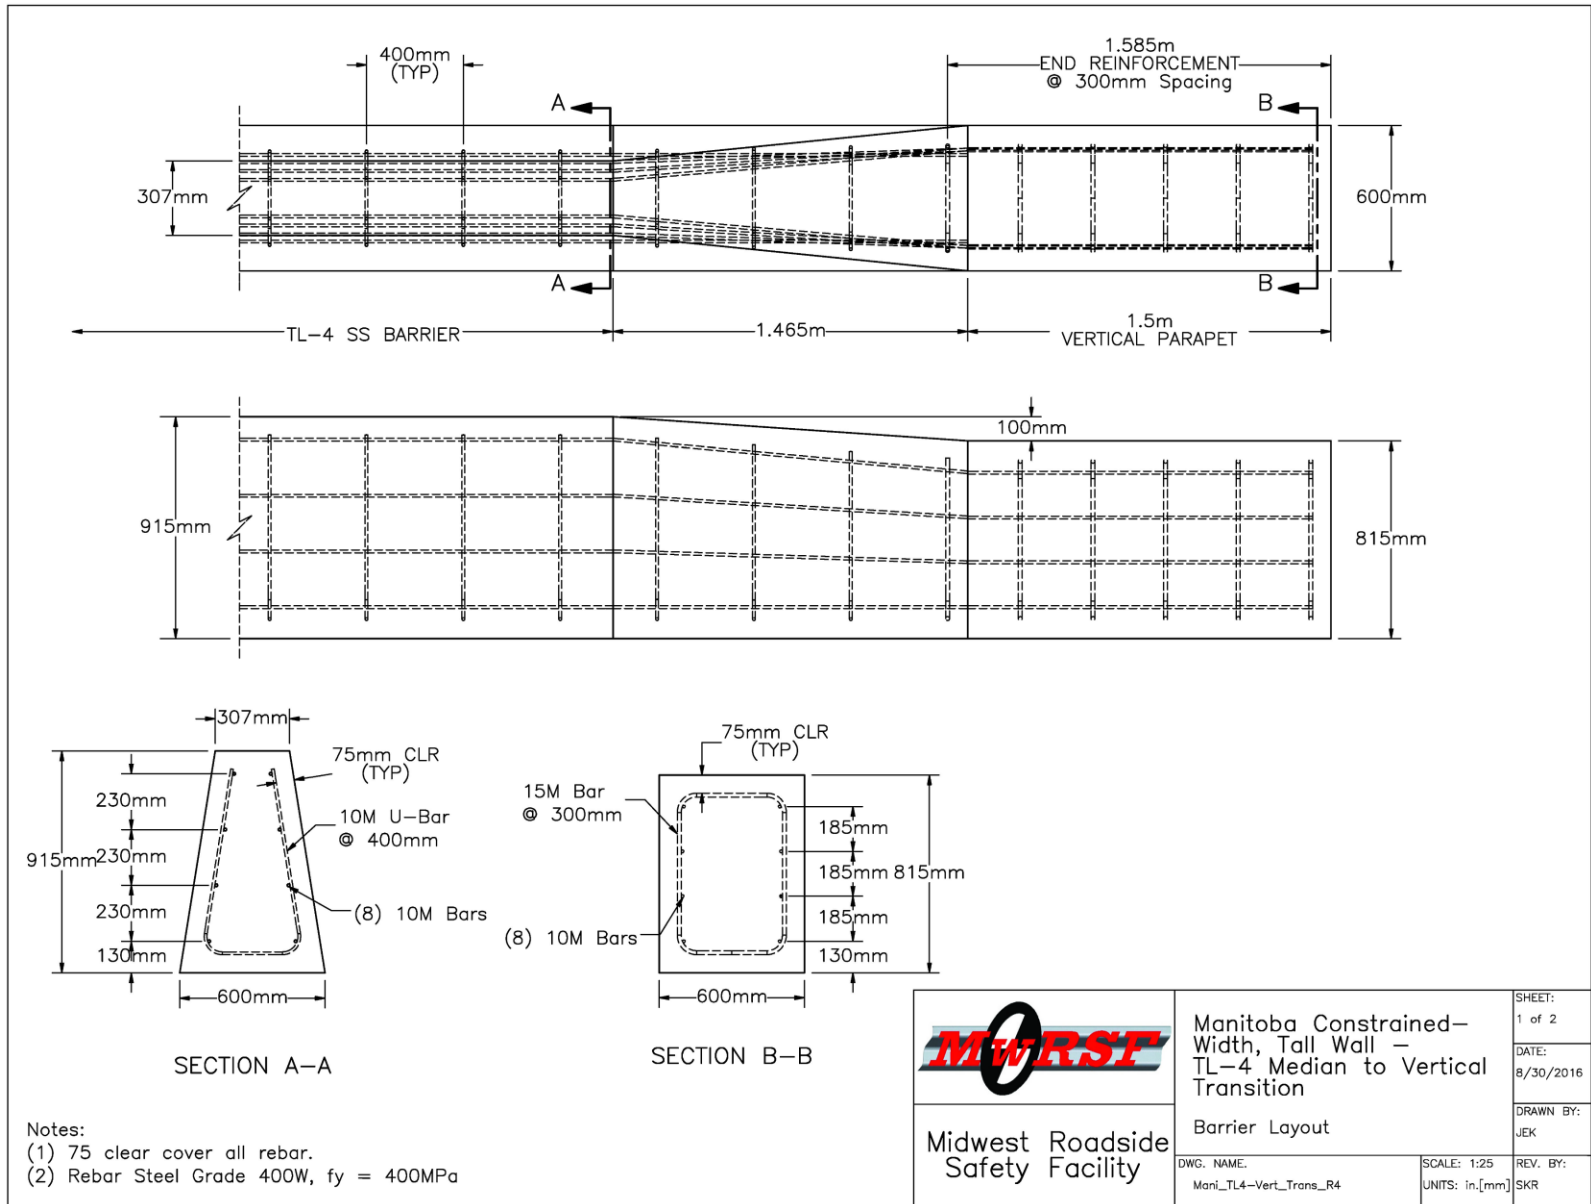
Transition Details, TL-4 Median Barrier to Vertical Parapet
